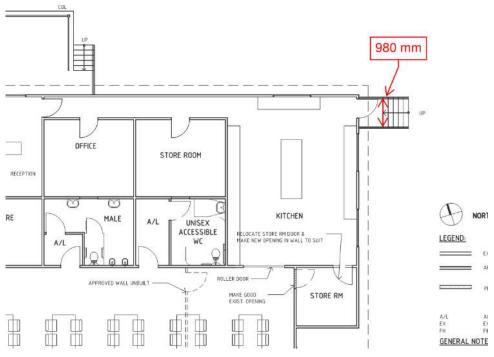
Stairs Leading from Kitchen with Unobstructed Width Less than 1 m
